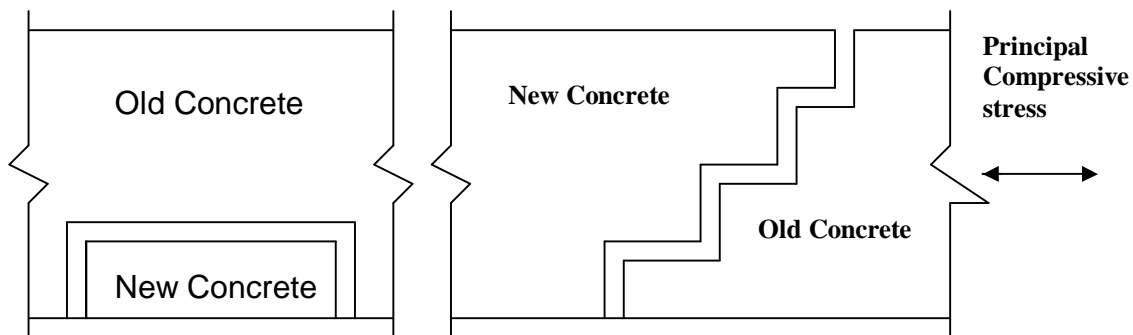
Desirable arrangement of joints between Old & New concrete.
